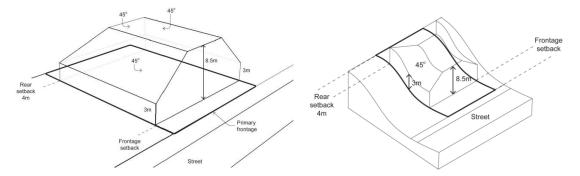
Permitted building envelope as required by provision 10.4.2 A3 (a) of the DIPS (flat site and sloping site⁸ version shown) (Source: Devonport Interim Planning Scheme 2013).
